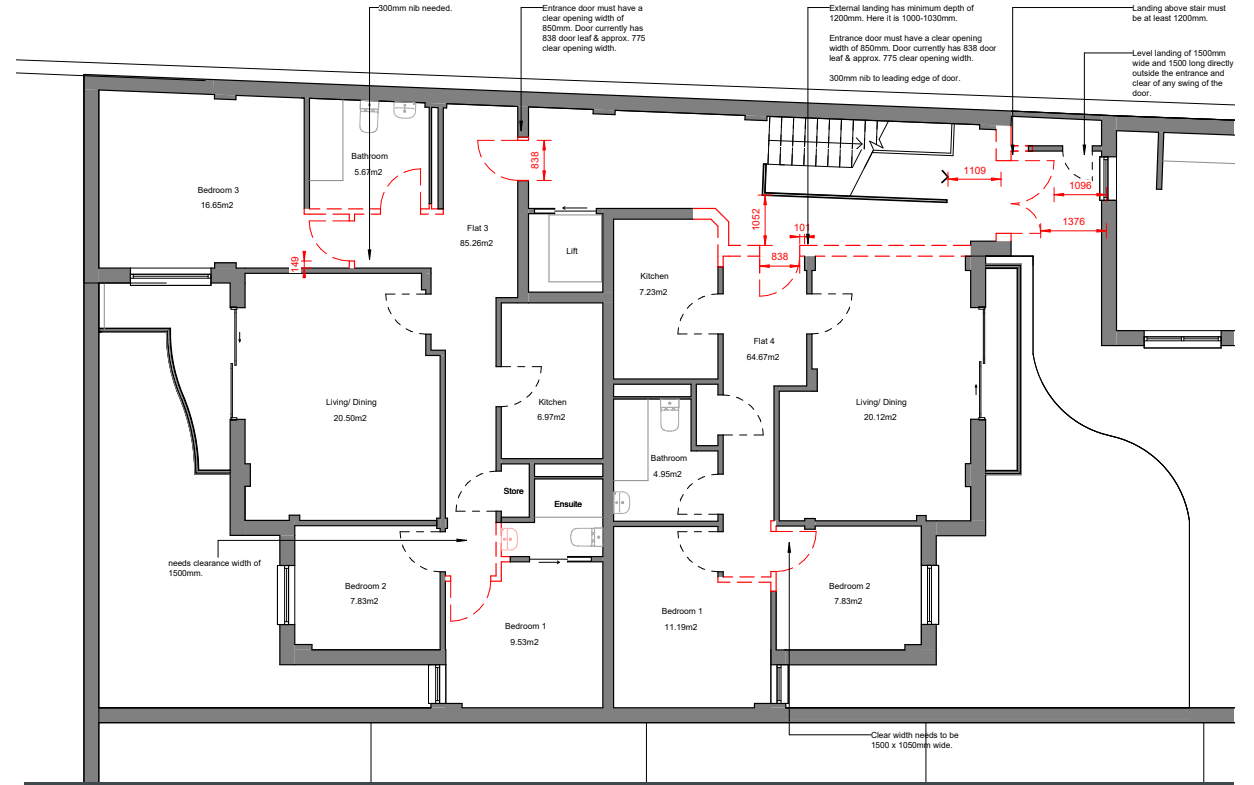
BLOCK 3 APPROVED GROUND FLOOR PLAN
